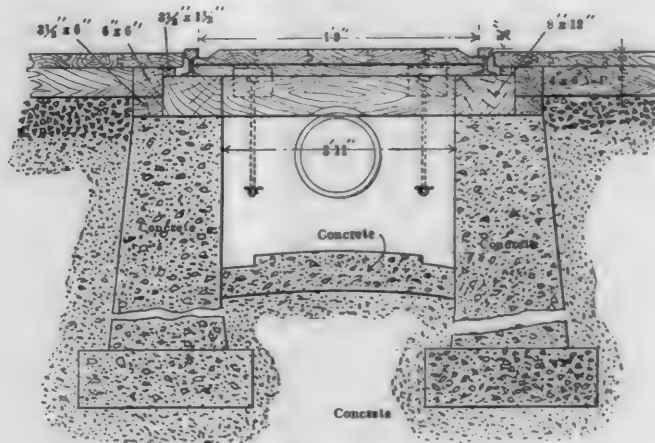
CROSS-SECTION THROUGH ENGINE PIT.
